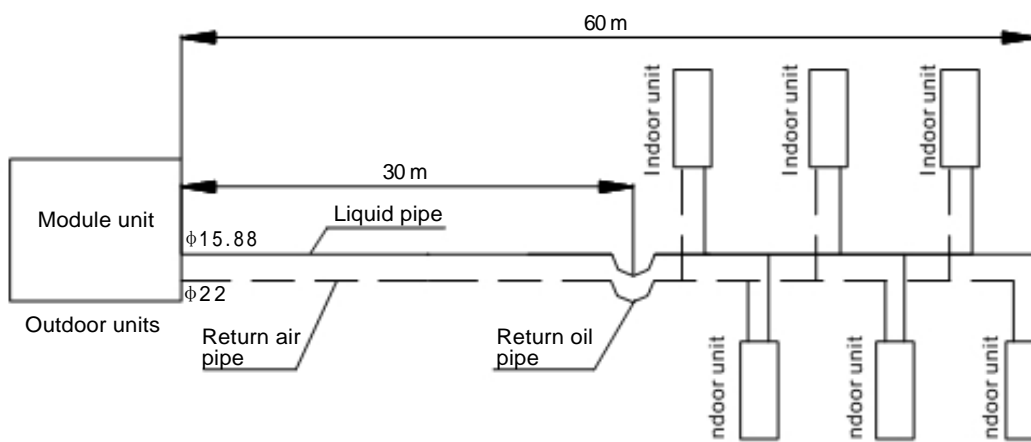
9 : Design drawing of return oil elbows -Upright Direction
